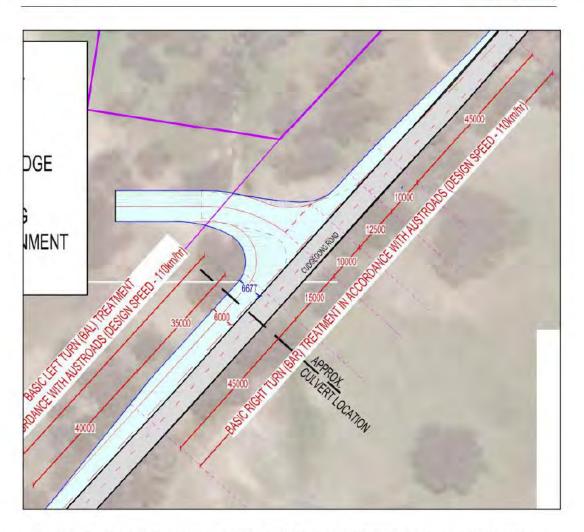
PROPOSED CUDGEGONG ROAD / SITE ACCESS INTERSECTION LAYOUT (CONCEPT – MAGNIFIED)
